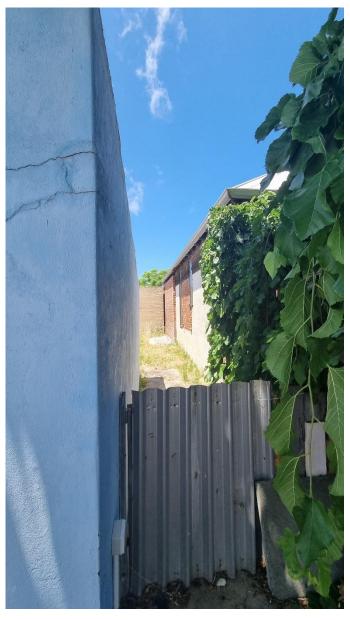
side setback area of subject site and 13 Sydney Street (east)
